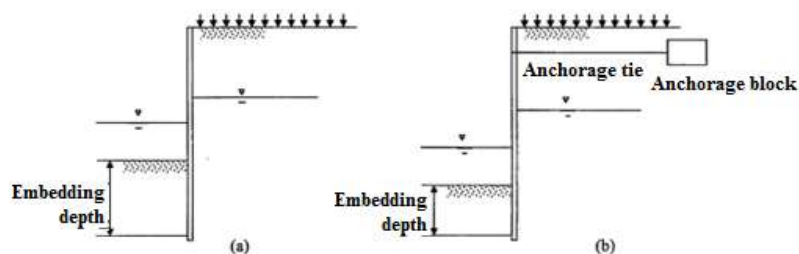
Sheet-pile wall: (a) cantilever (b) anchored [9]
